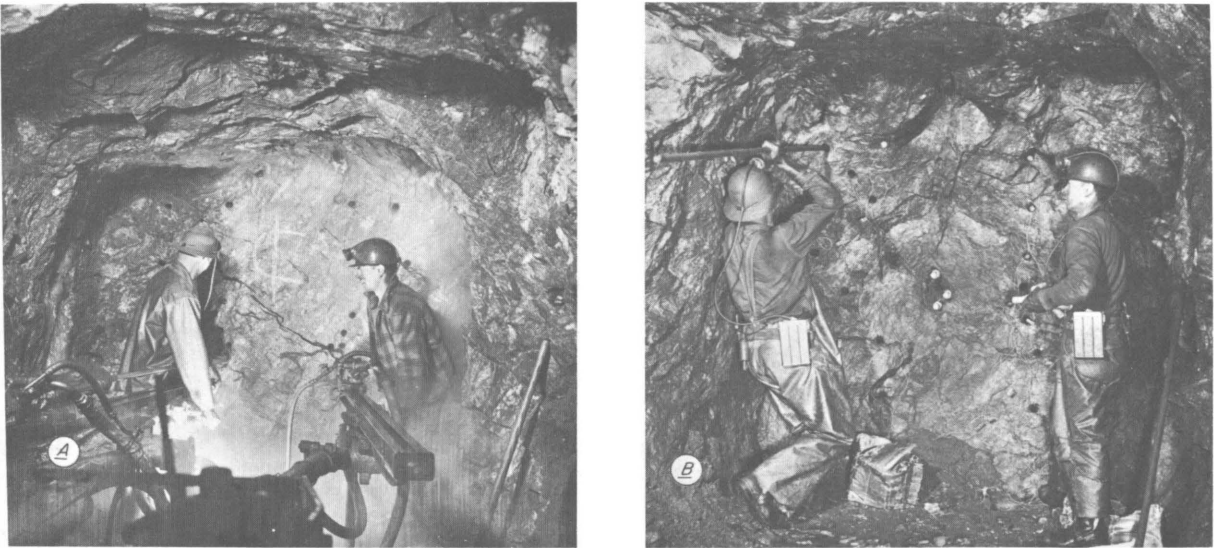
Drilling and Loading Explosives in a Development Heading: A, Drilling a Round; B, Loading Explosives.
